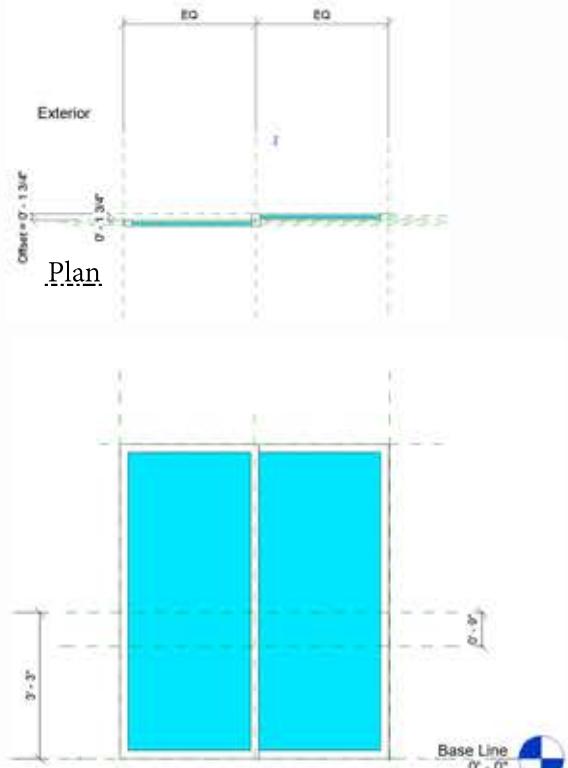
DETAILED DRAWINGS [Enzyme Tower, Hong-Kong].
